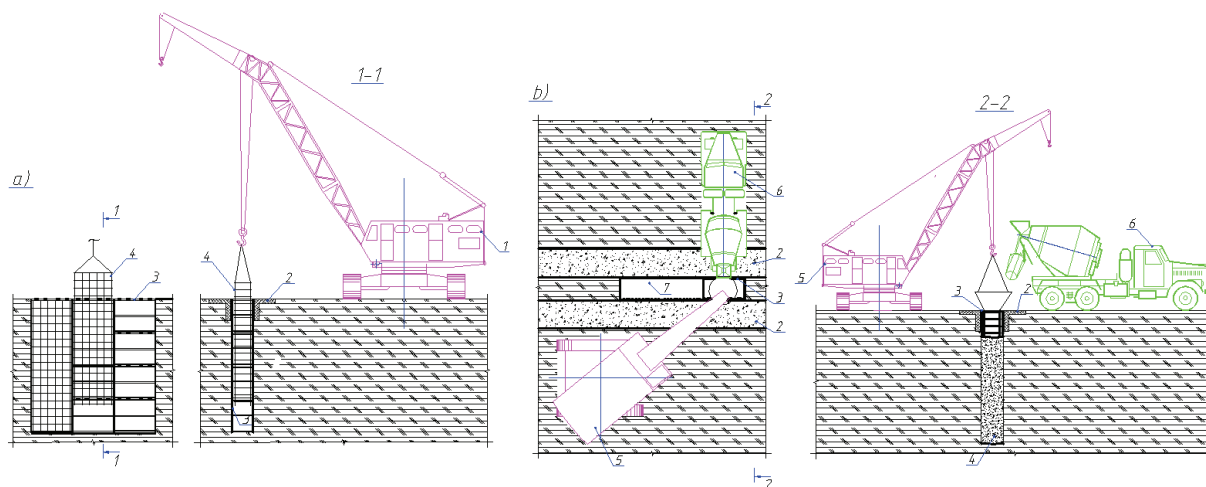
Installation of the metal formwork and placing concrete in the immovable metal formwork: a) installation of the metal formwork in the immovable metal formwork; b) concreting process in the immovable metal formwork.
